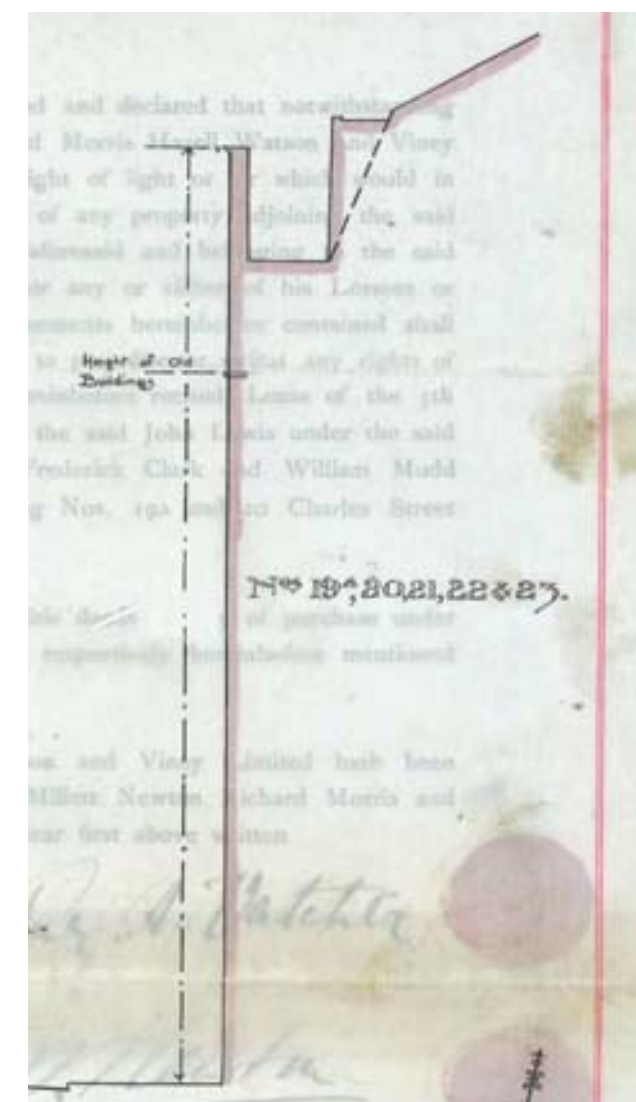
Outline of previous building occupying 20-23 Greville Street.
